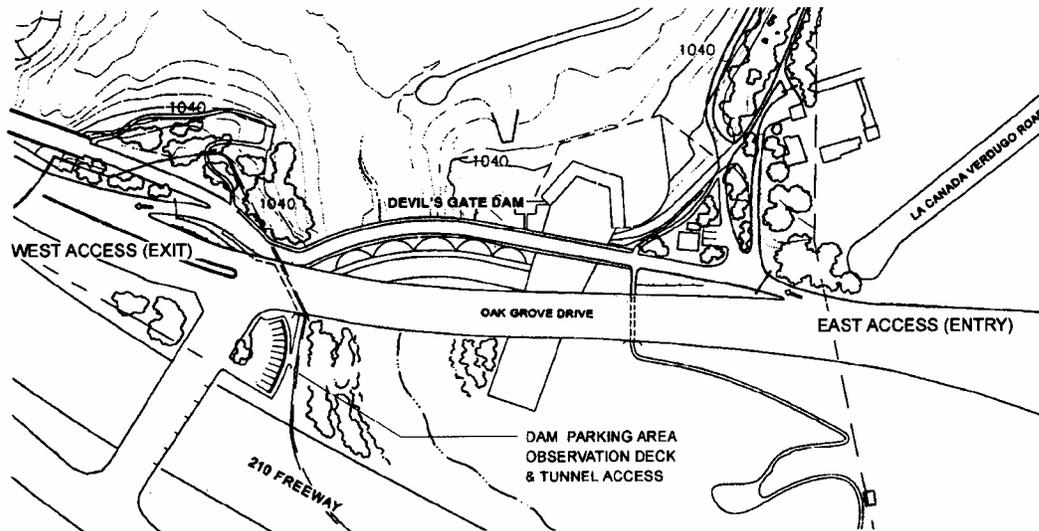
, Slip Lane Entry and Exit to Dam
